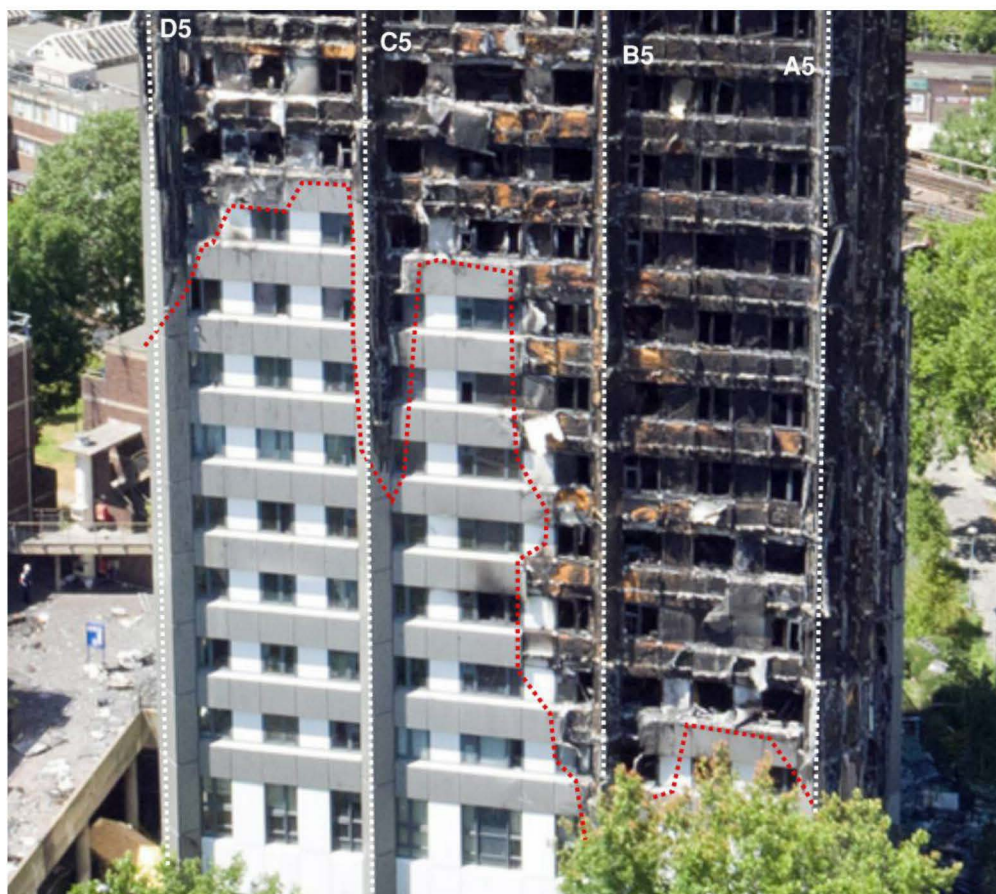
Post-fire damage on East elevation of Grenfell Tower (METS00020589)
